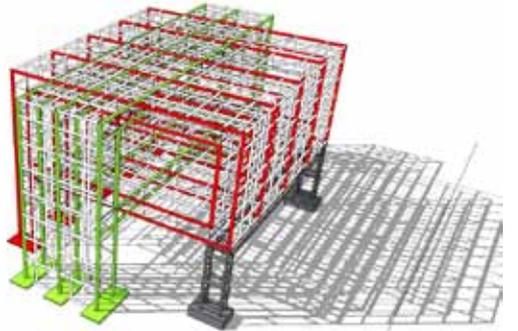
diagram of supporting steel frames used to fix cladding to and to make structure rigid.
